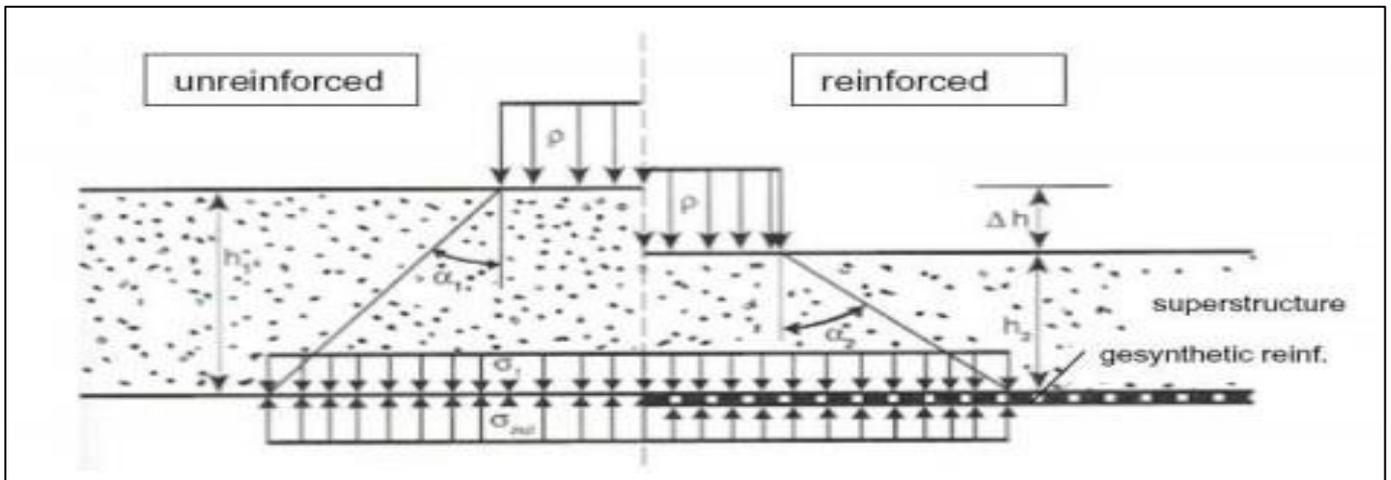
Use of Geotextiles for Soil Reinforcement (Clemente Fuggini et al 2016)
